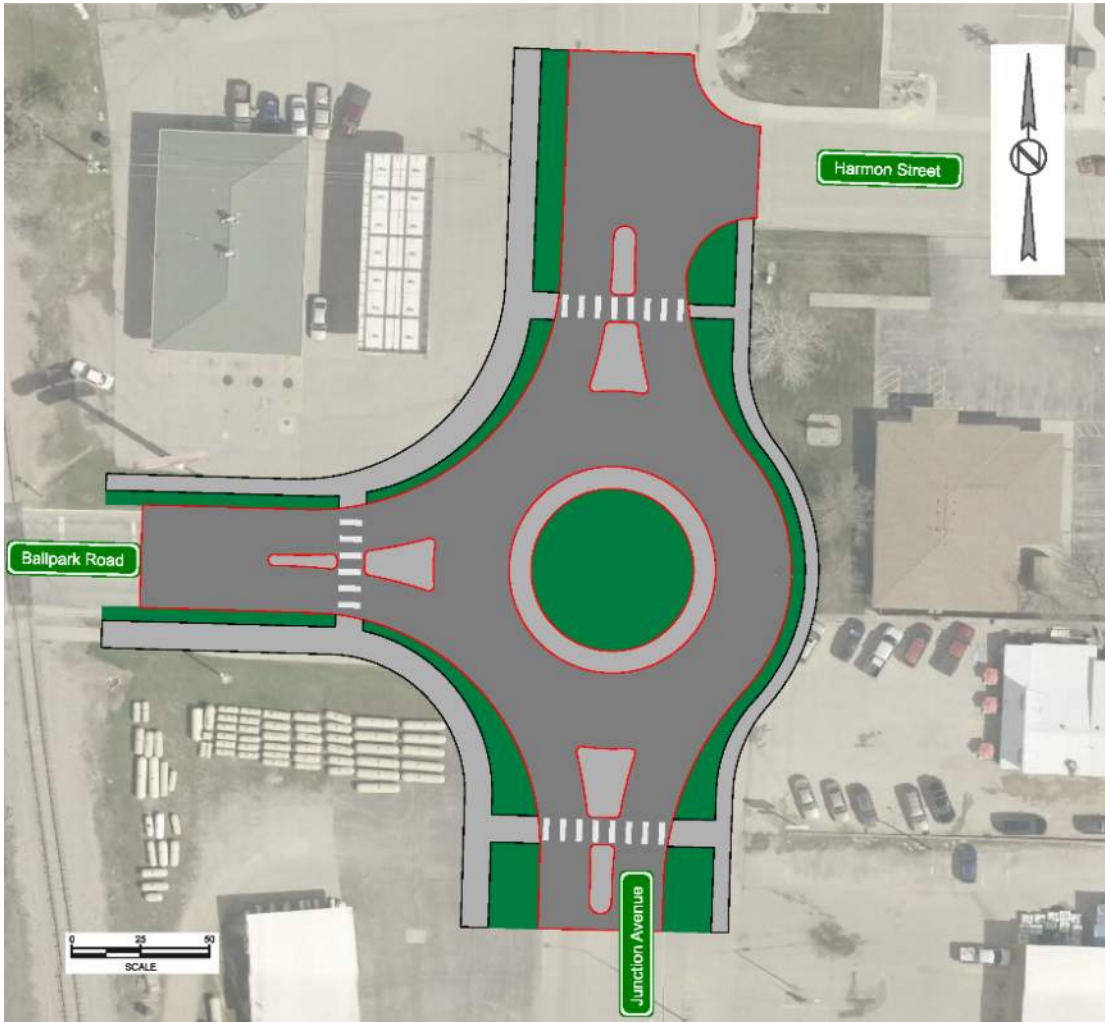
Ballpark Road & Junction Avenue (Roundabout)
